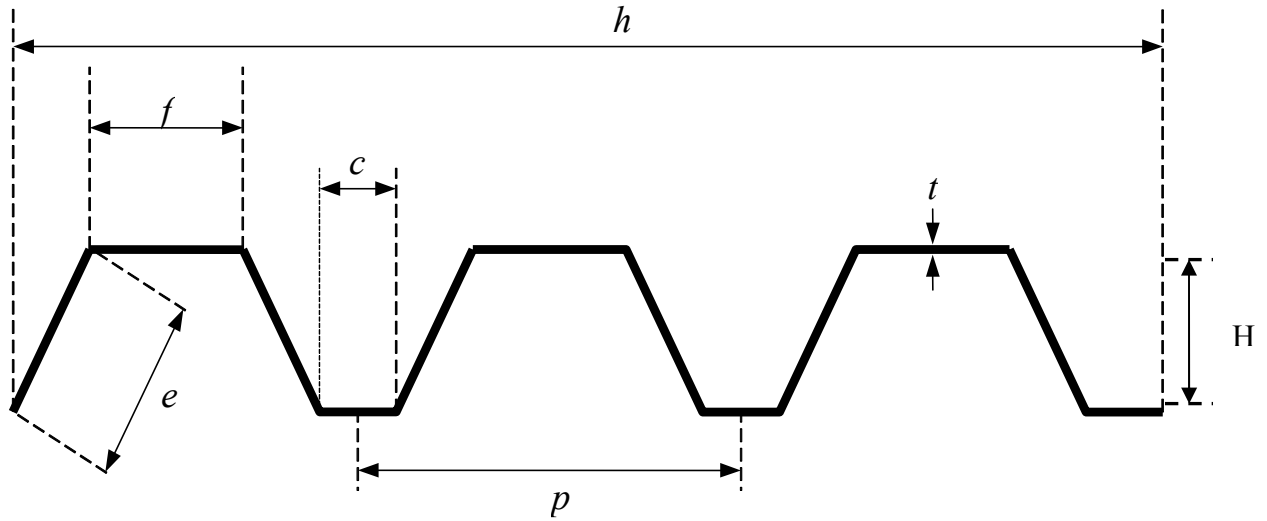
Typical Stay-in-Place Metal Deck Form Profile
